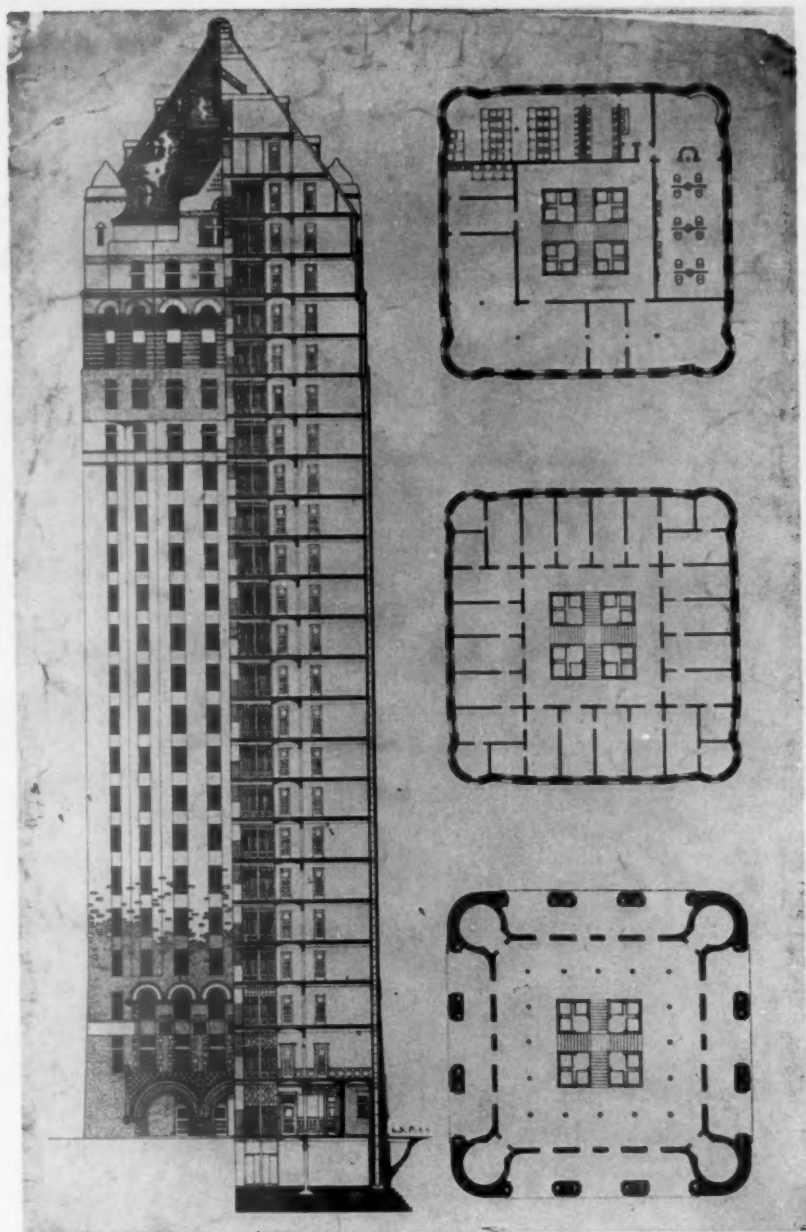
Half Elevation, Half Section, Plans for 25-Story Building, Dated 1883
